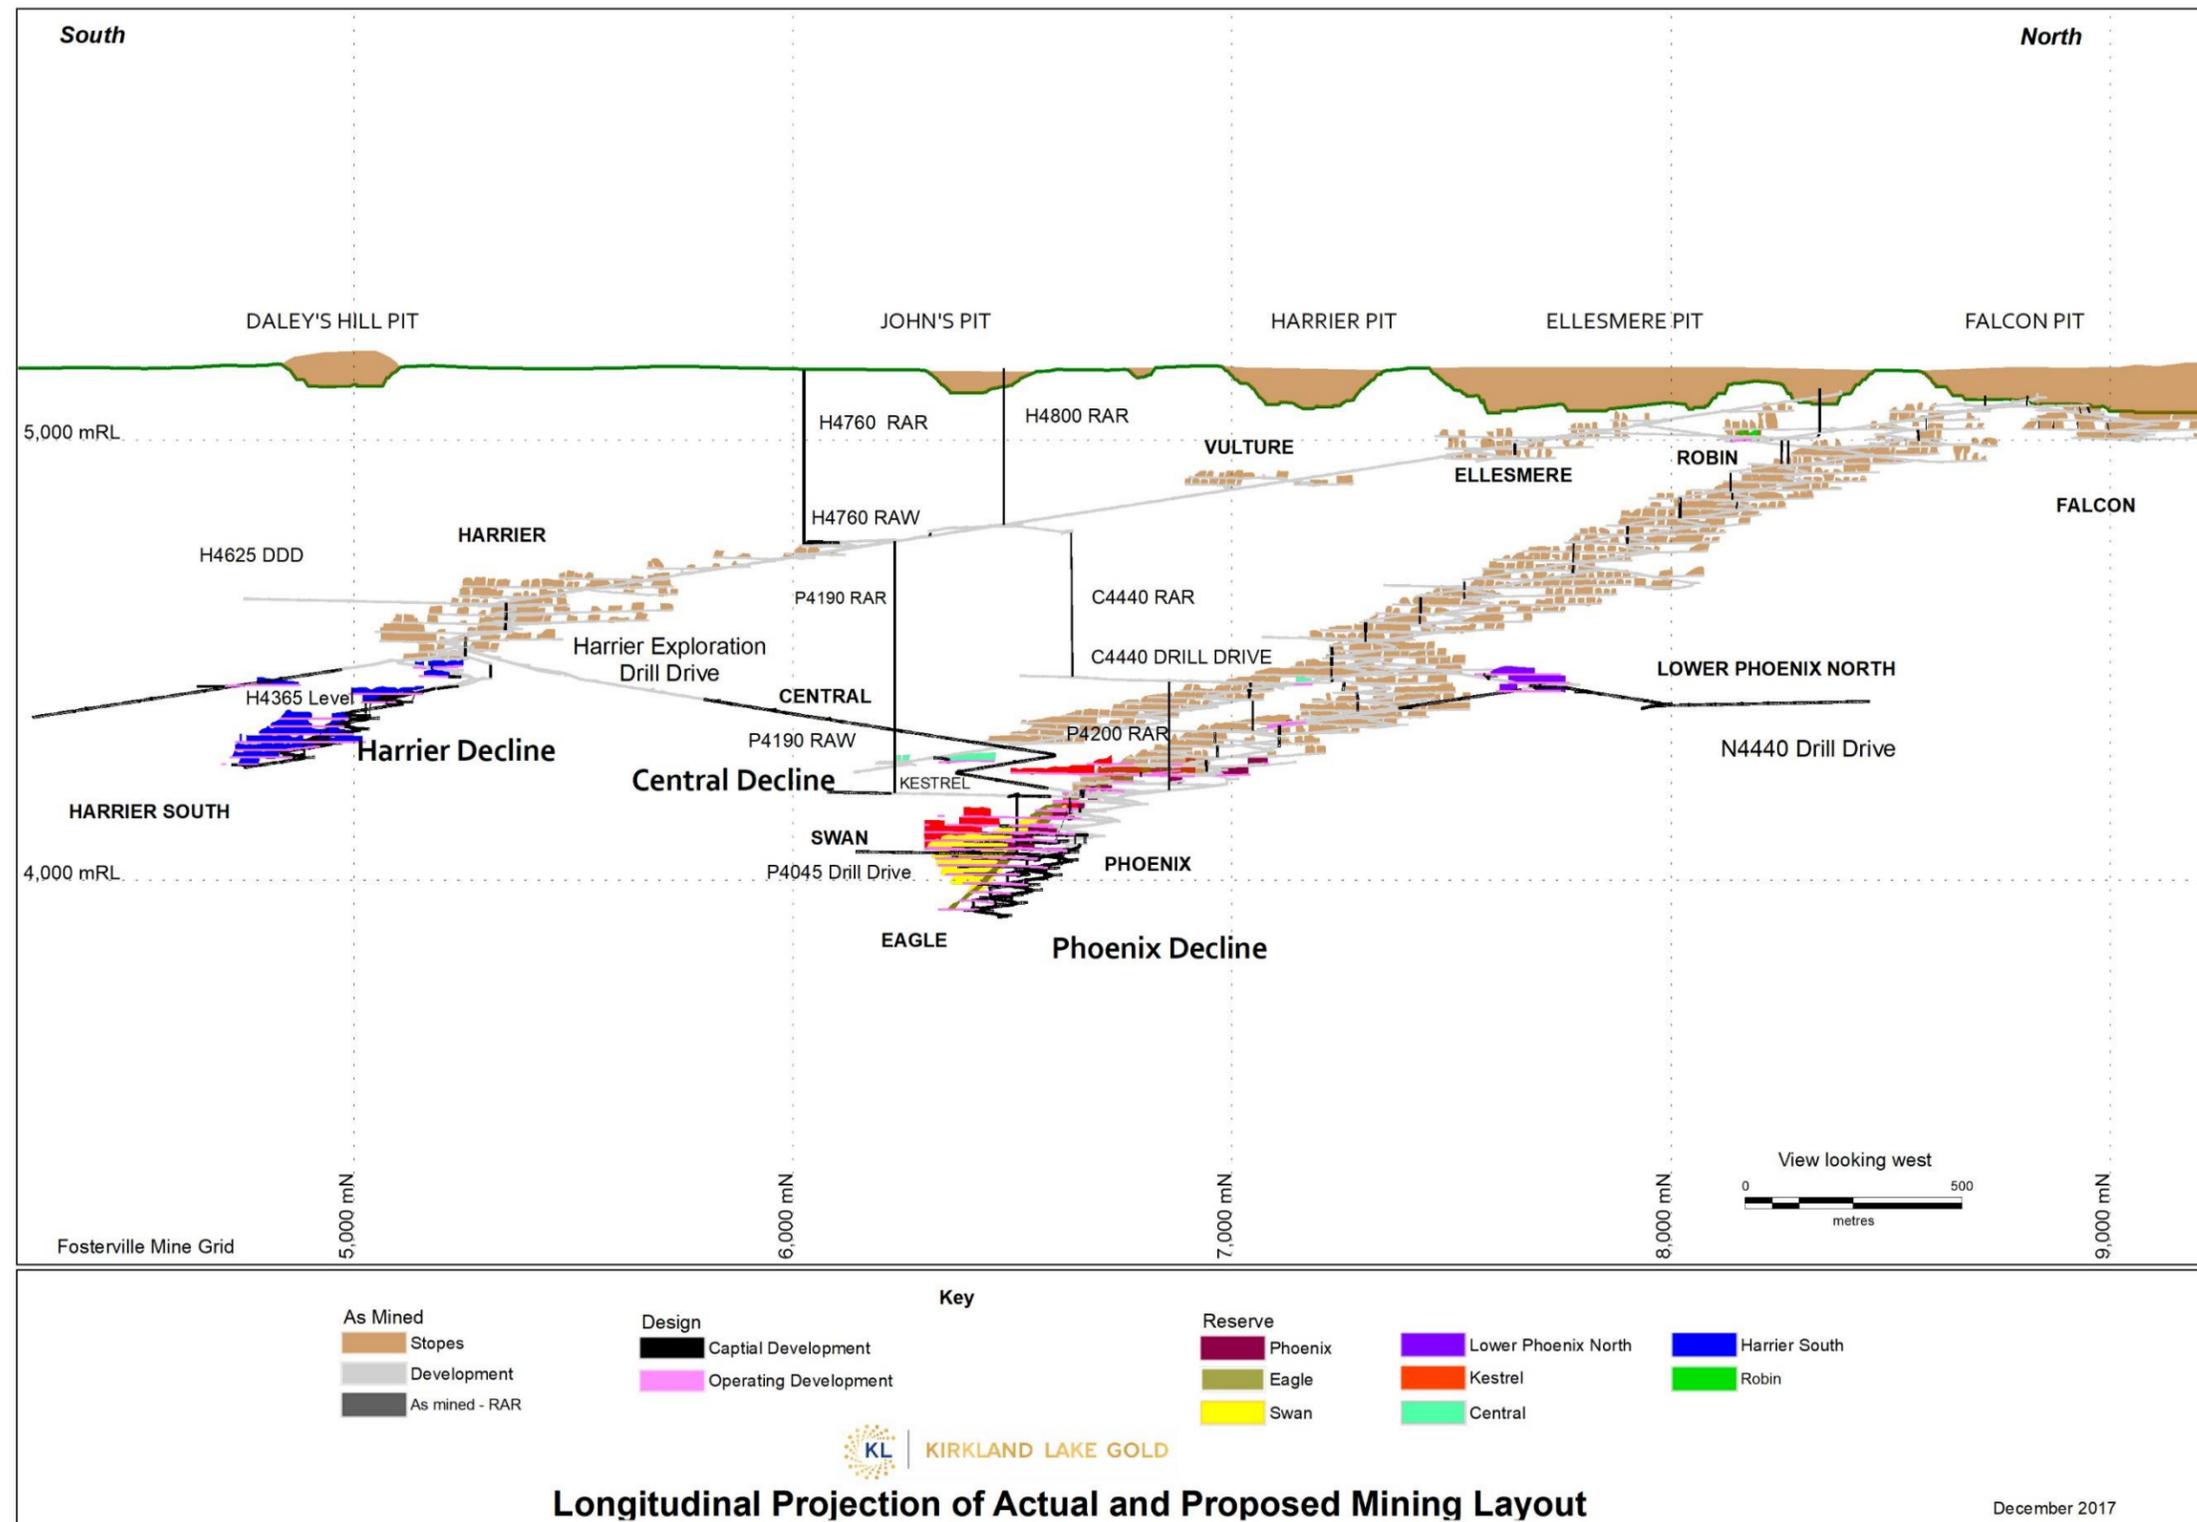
LONGITUDINAL PROJECTION OF ACTUAL AND PROPOSED MINING LAYOUT AS AT DECEMBER 31, 2017
